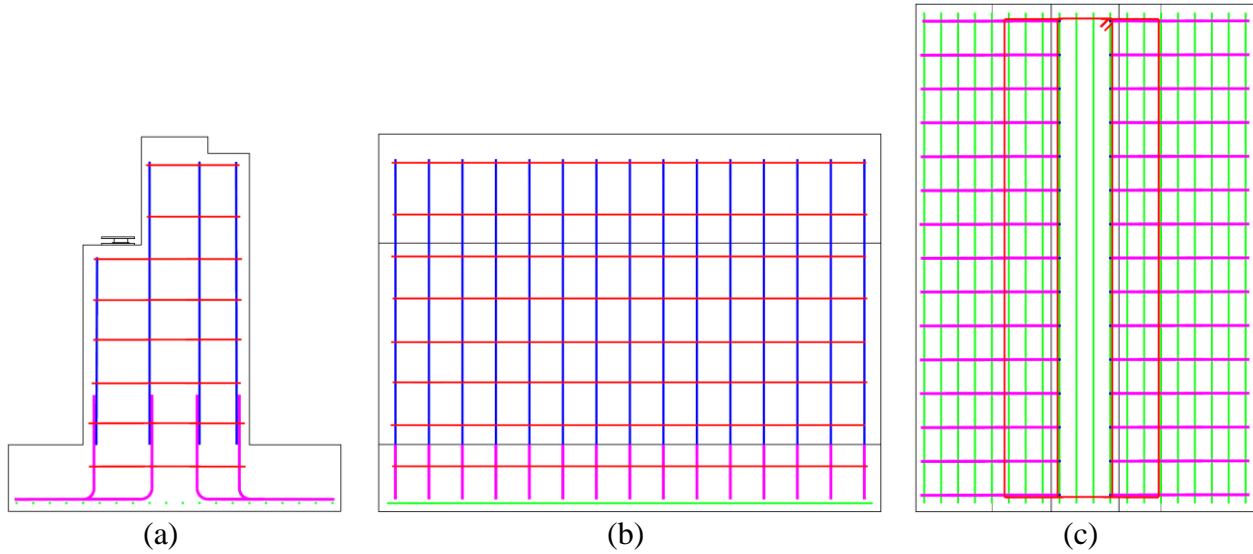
(a) Abutment cross section; (b) profile view; (c) plan view.
